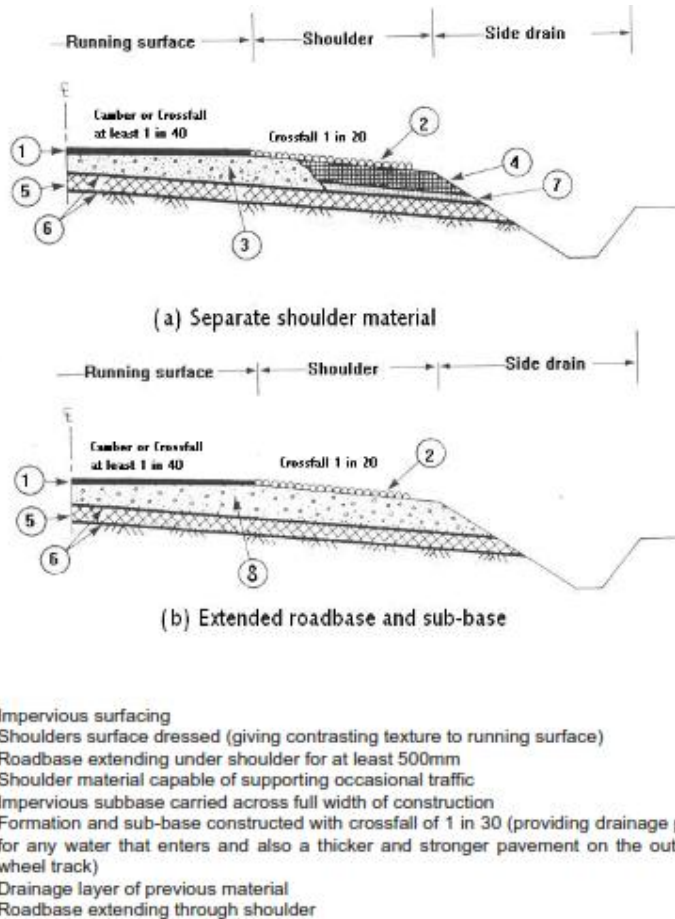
Cross section of road showing drainage arrangement (Source: MWT-RU, 2010)
